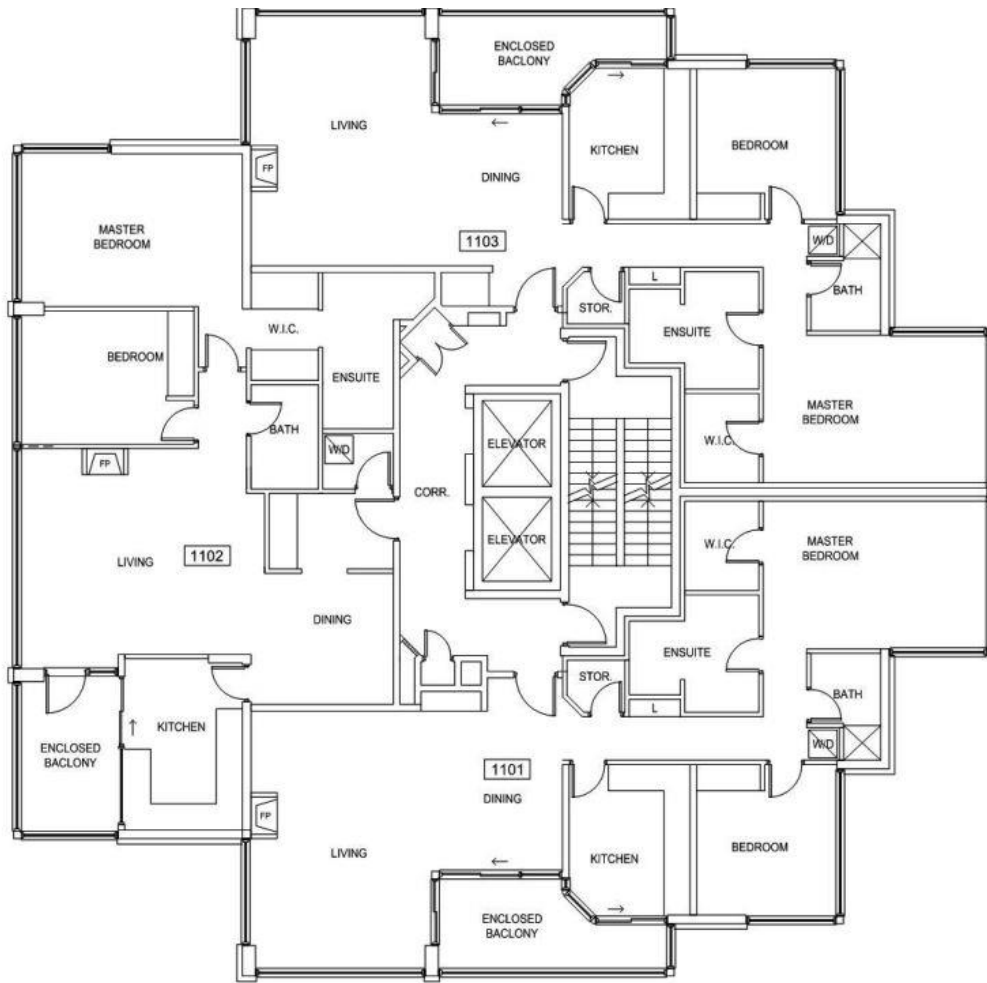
Floor 2 – 12 layout (RDH 2011)
